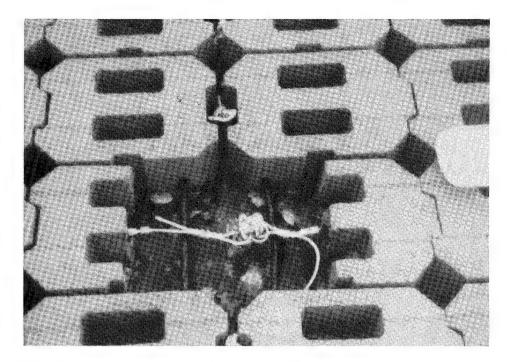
CCM anchor point and lateral seam between mats, Trout Lake Dam
